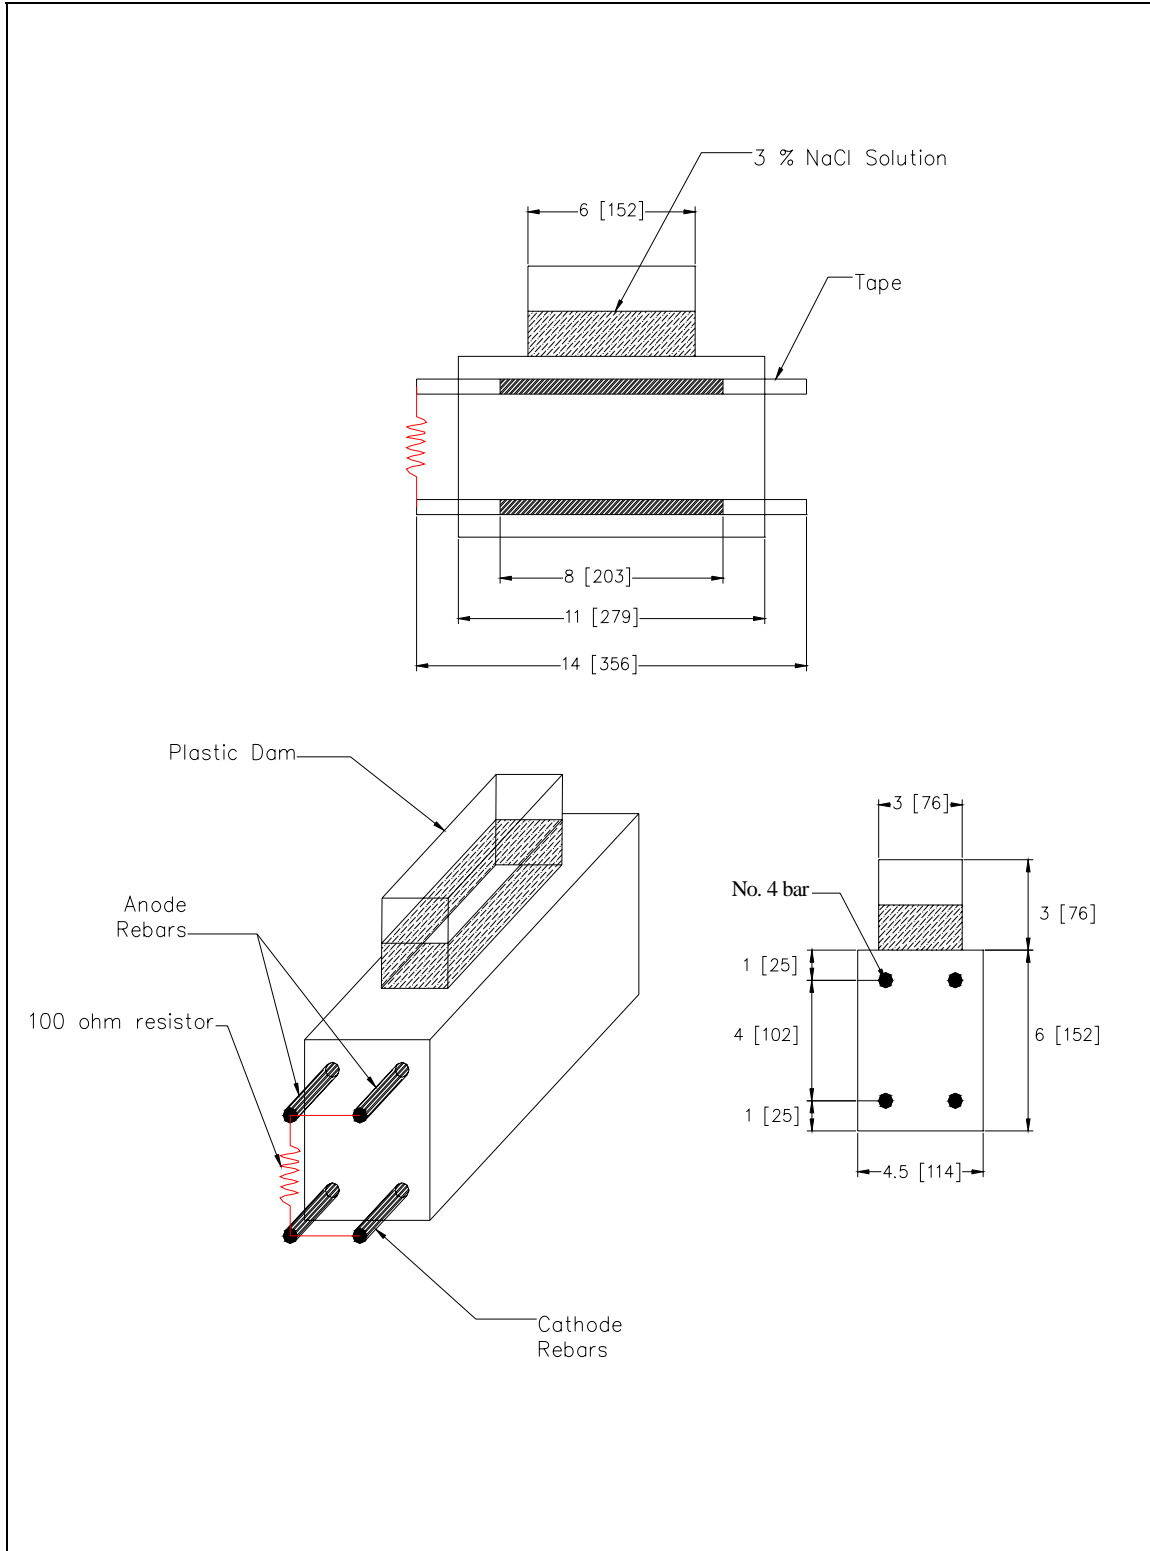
Details and dimensions (in (mm)) of beam specimens.
